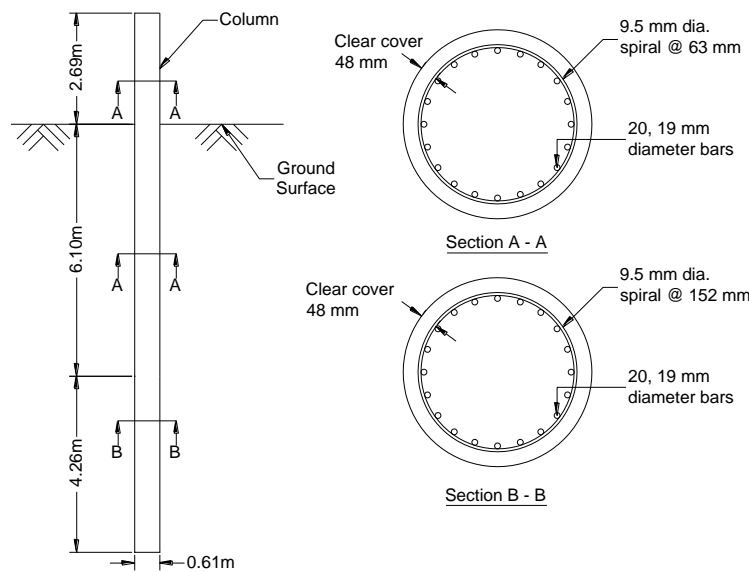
Cross-section details of column-shafts (after Sritharan et al., 2007); (1 in. = 25.4 mm = 2.54×10^{-2} m)
